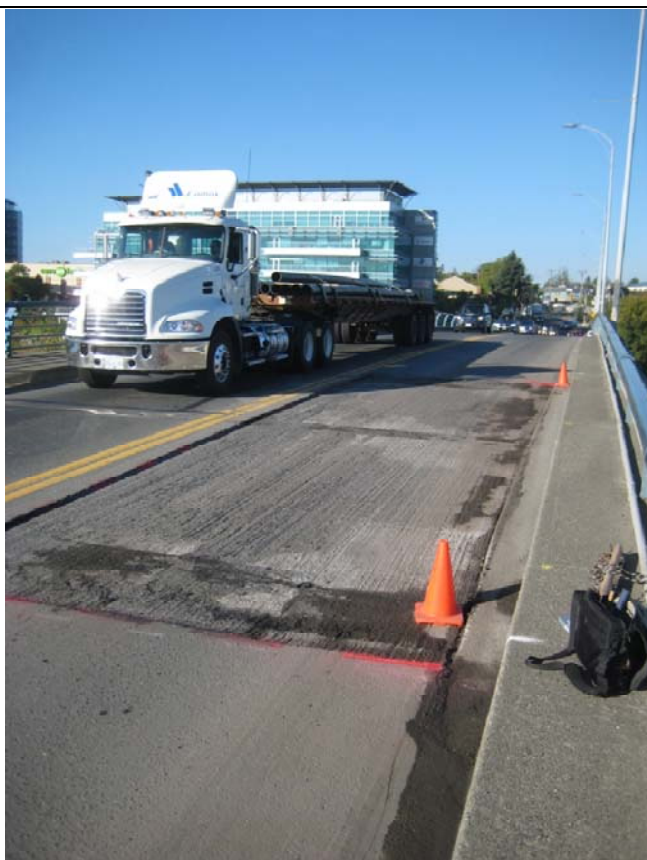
View of the asphalt removal test patch. The test patch was centrally located over Pier #1 in the West bound lane of traffic.
